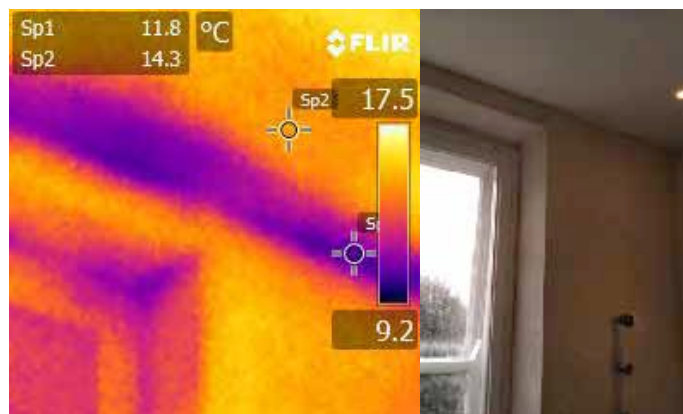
116 Abbeyforegate, Shrewsbury – ground floor living room, south wall.
